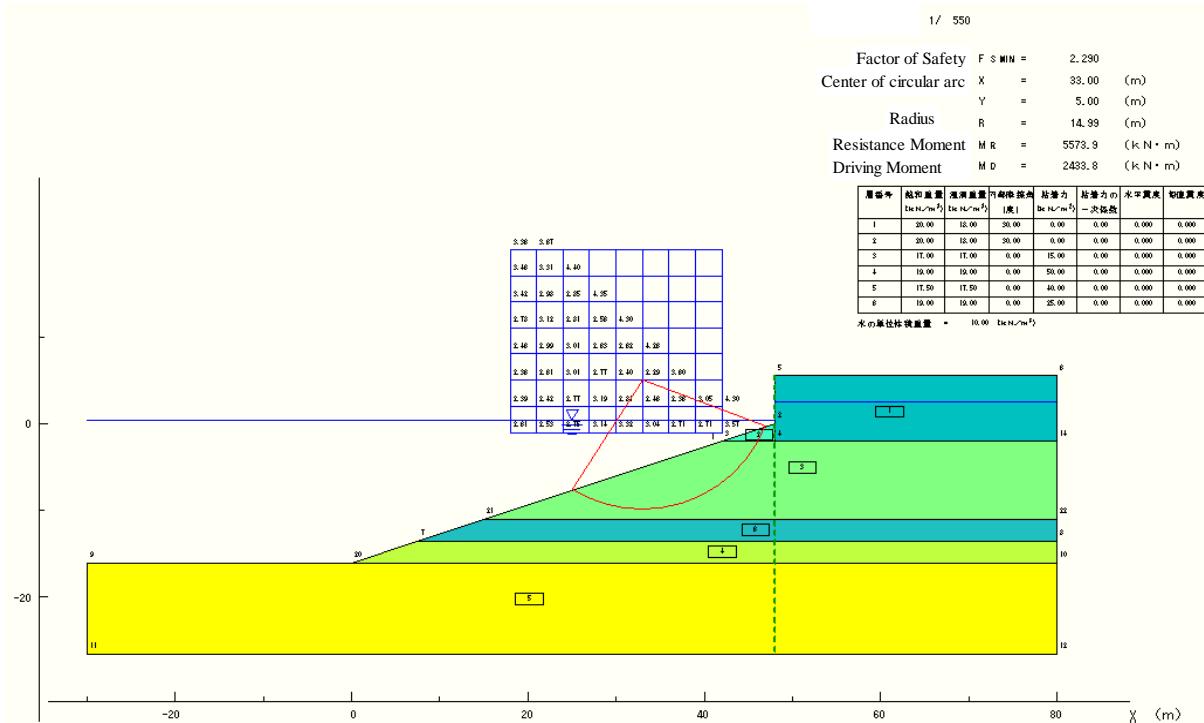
Slope Stability Analysis in front of the Earth Retaining Wall
